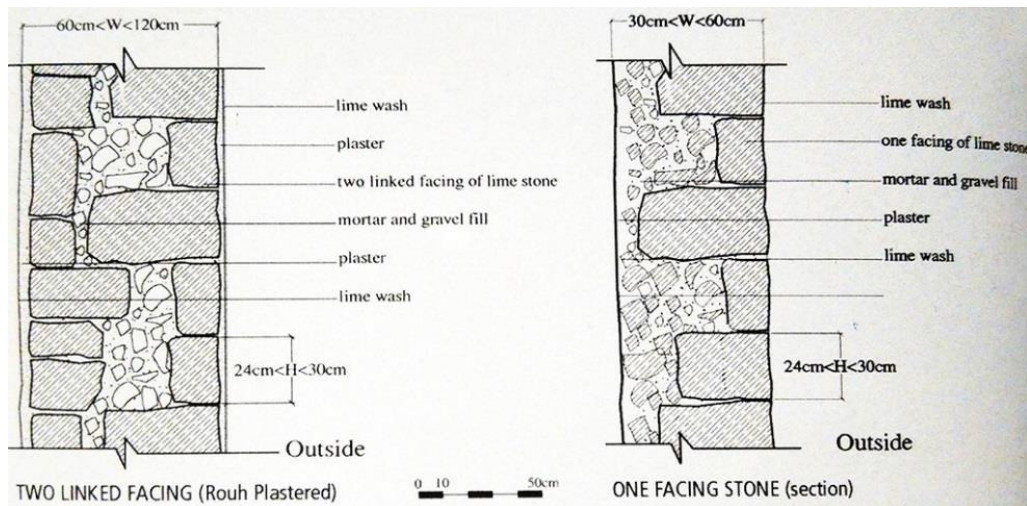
stone wall installed by mortar, two models: double facing & single thickness wall.
